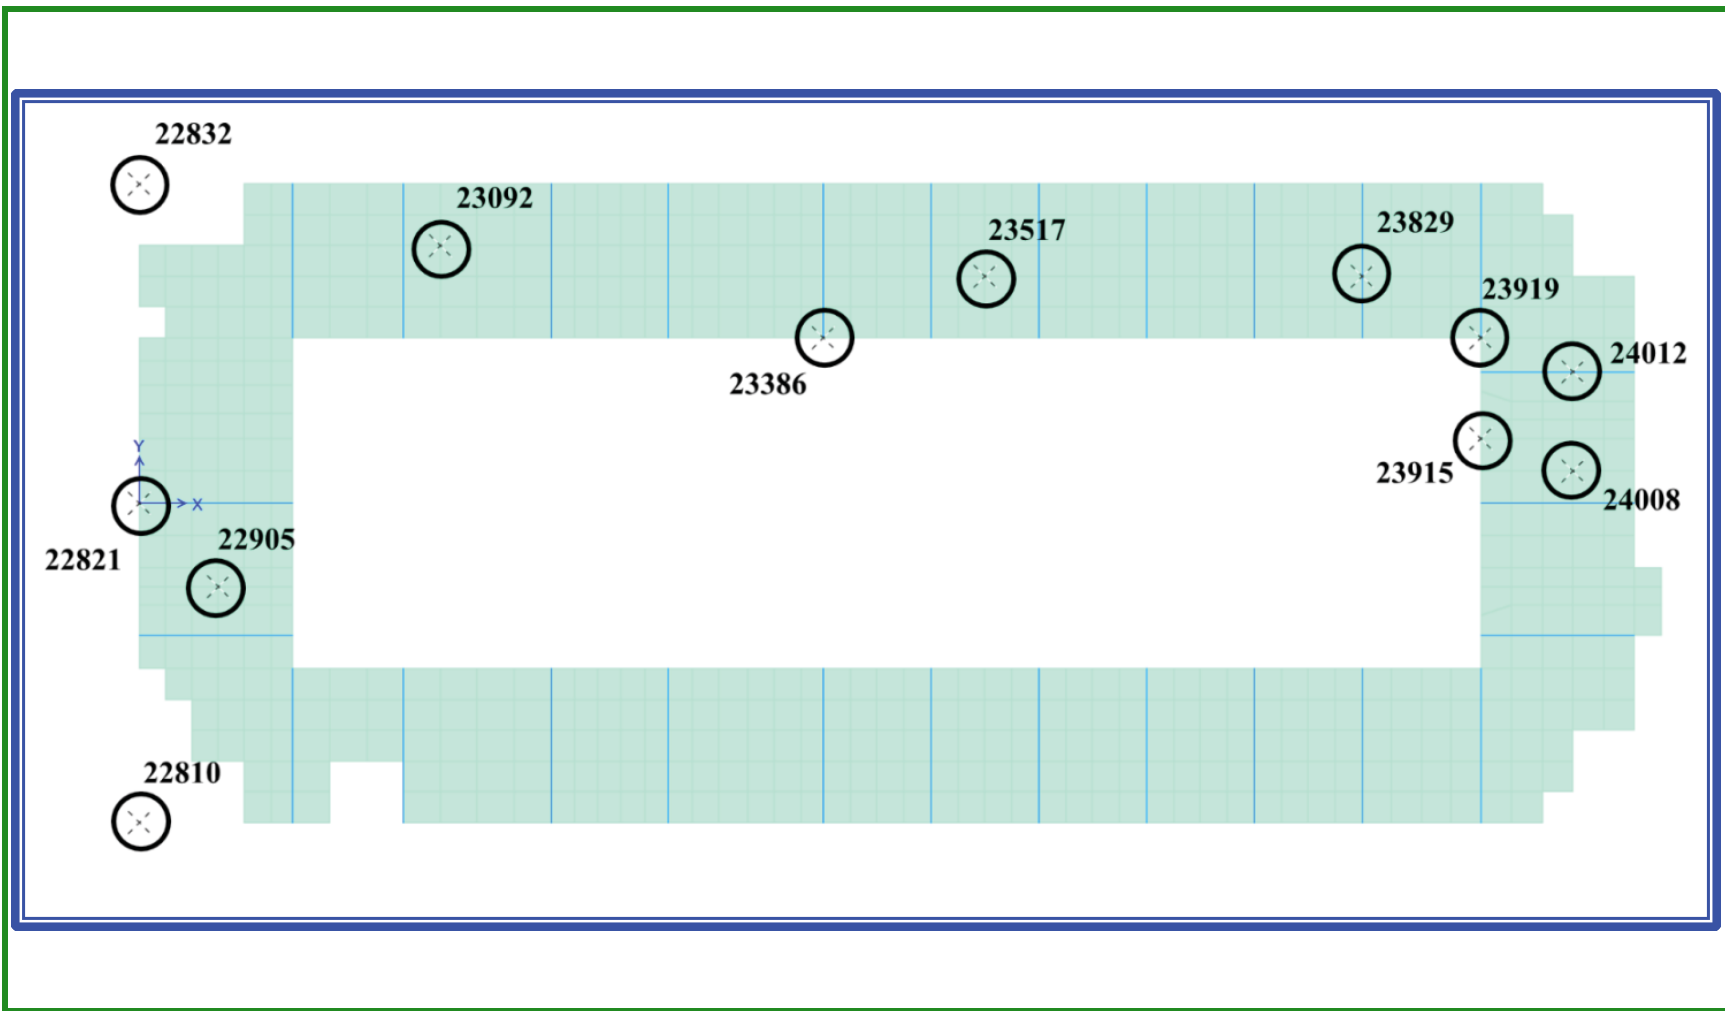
Floor ISRS Locations at TOC EL 126'-0"
